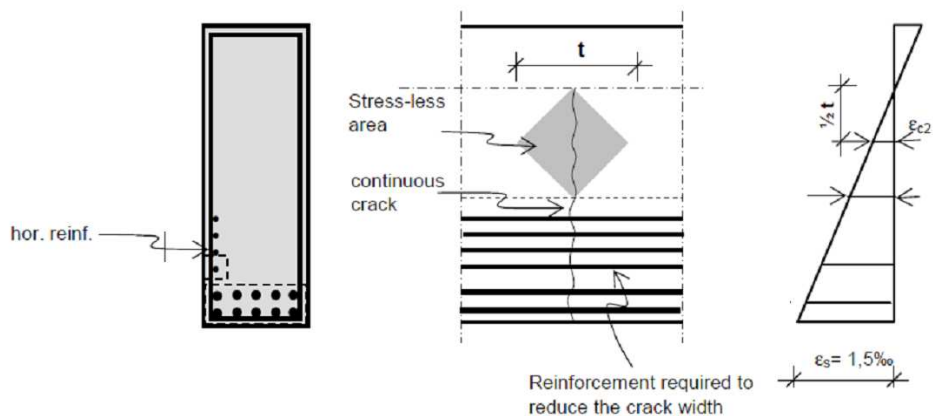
Stressless area in a concrete beam above the reinforced area
